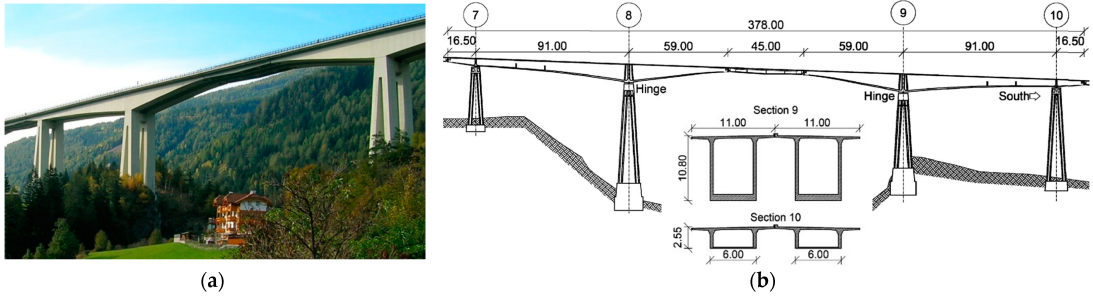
(a) The main span and northernmost cantilever of Colle Isarco Viaduct; (b) a longitudinal section of the viaduct between piers 7 and 10, and cross-sections of the box girders, with dimensions in meters.
